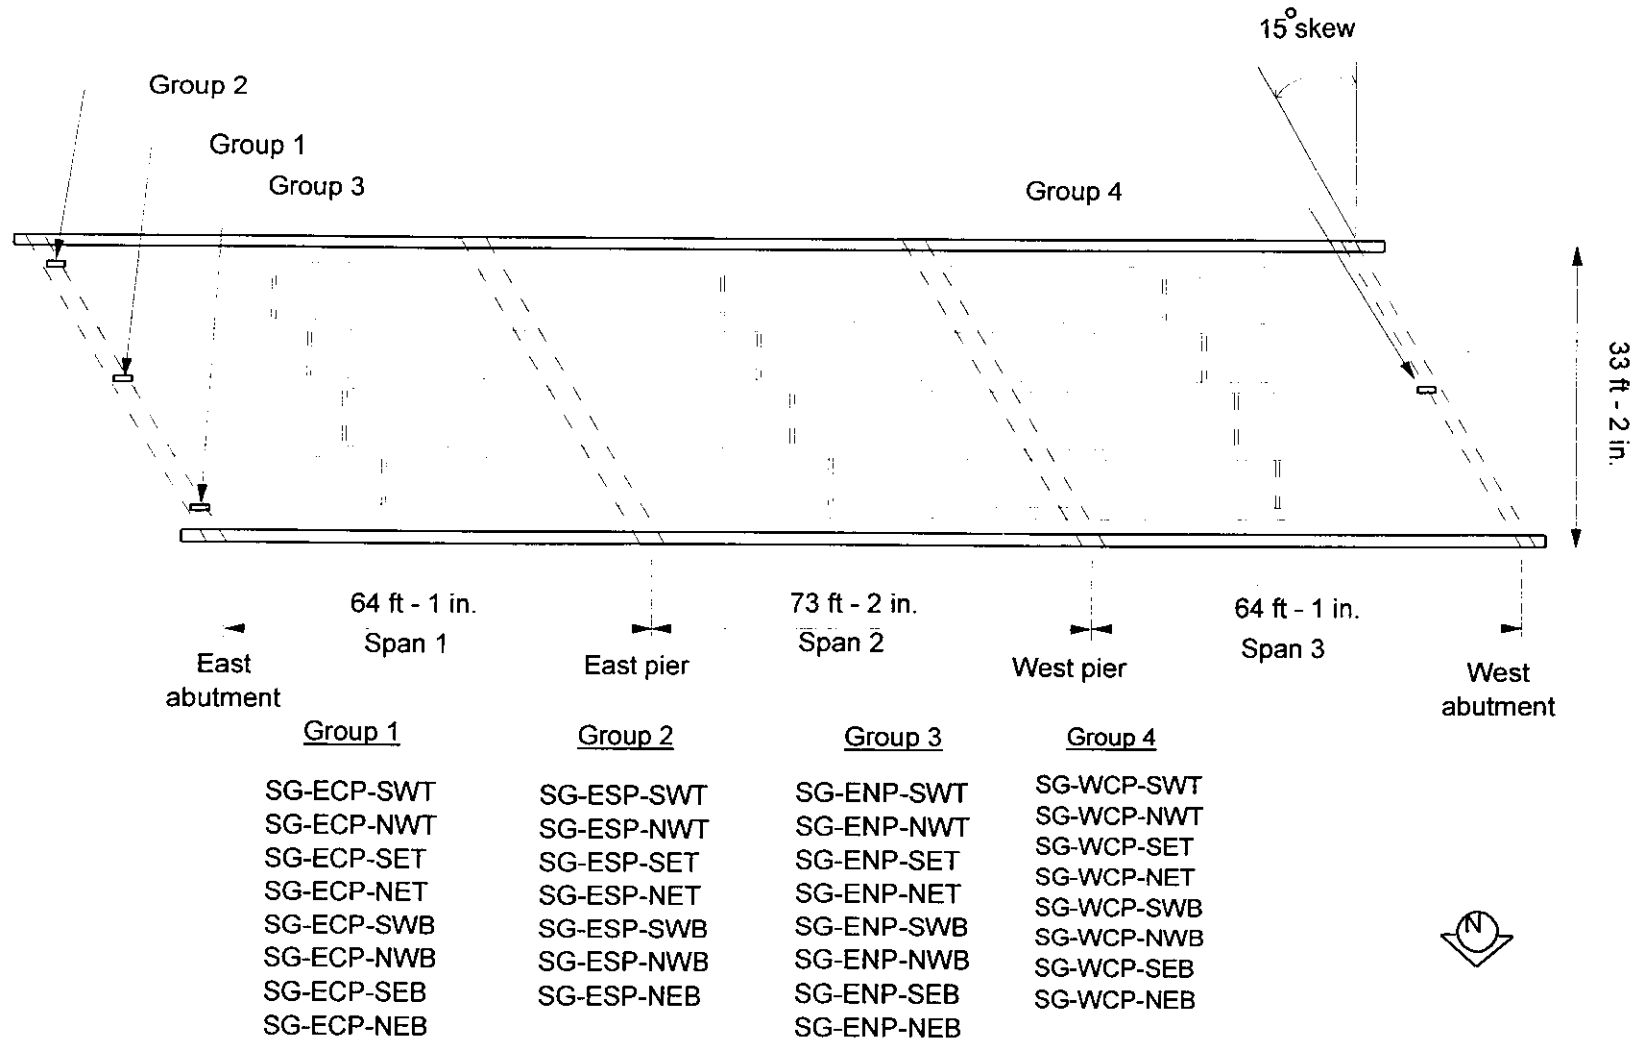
Pile strain gage locations at the Story County Bridge (not to scale)
